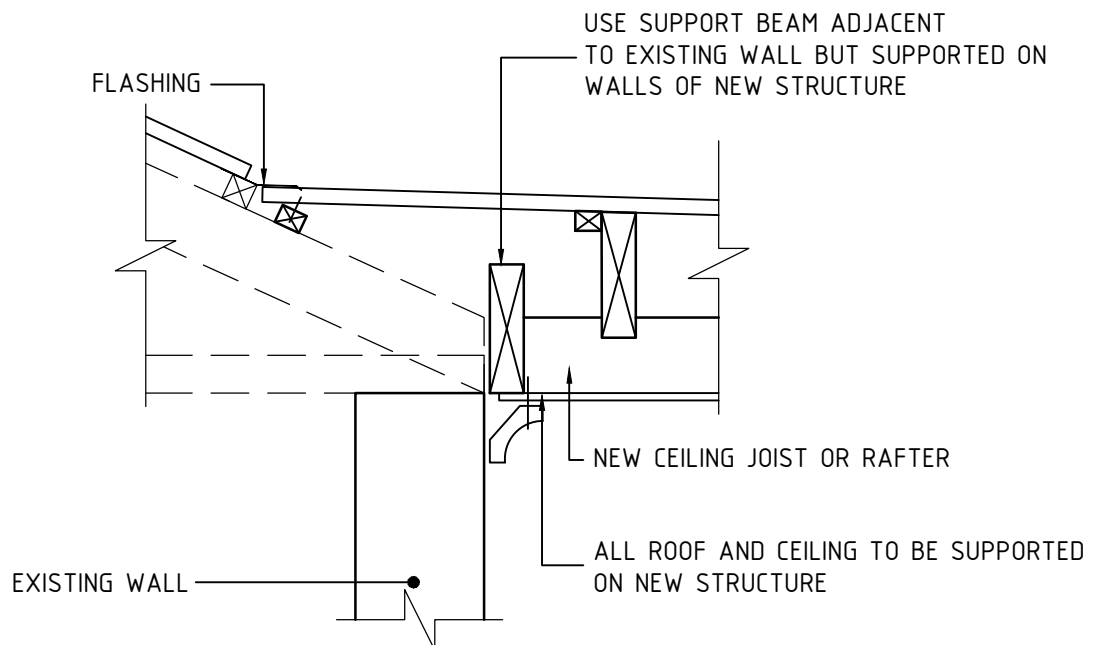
WALL / CEILING JUNCTION DETAIL
